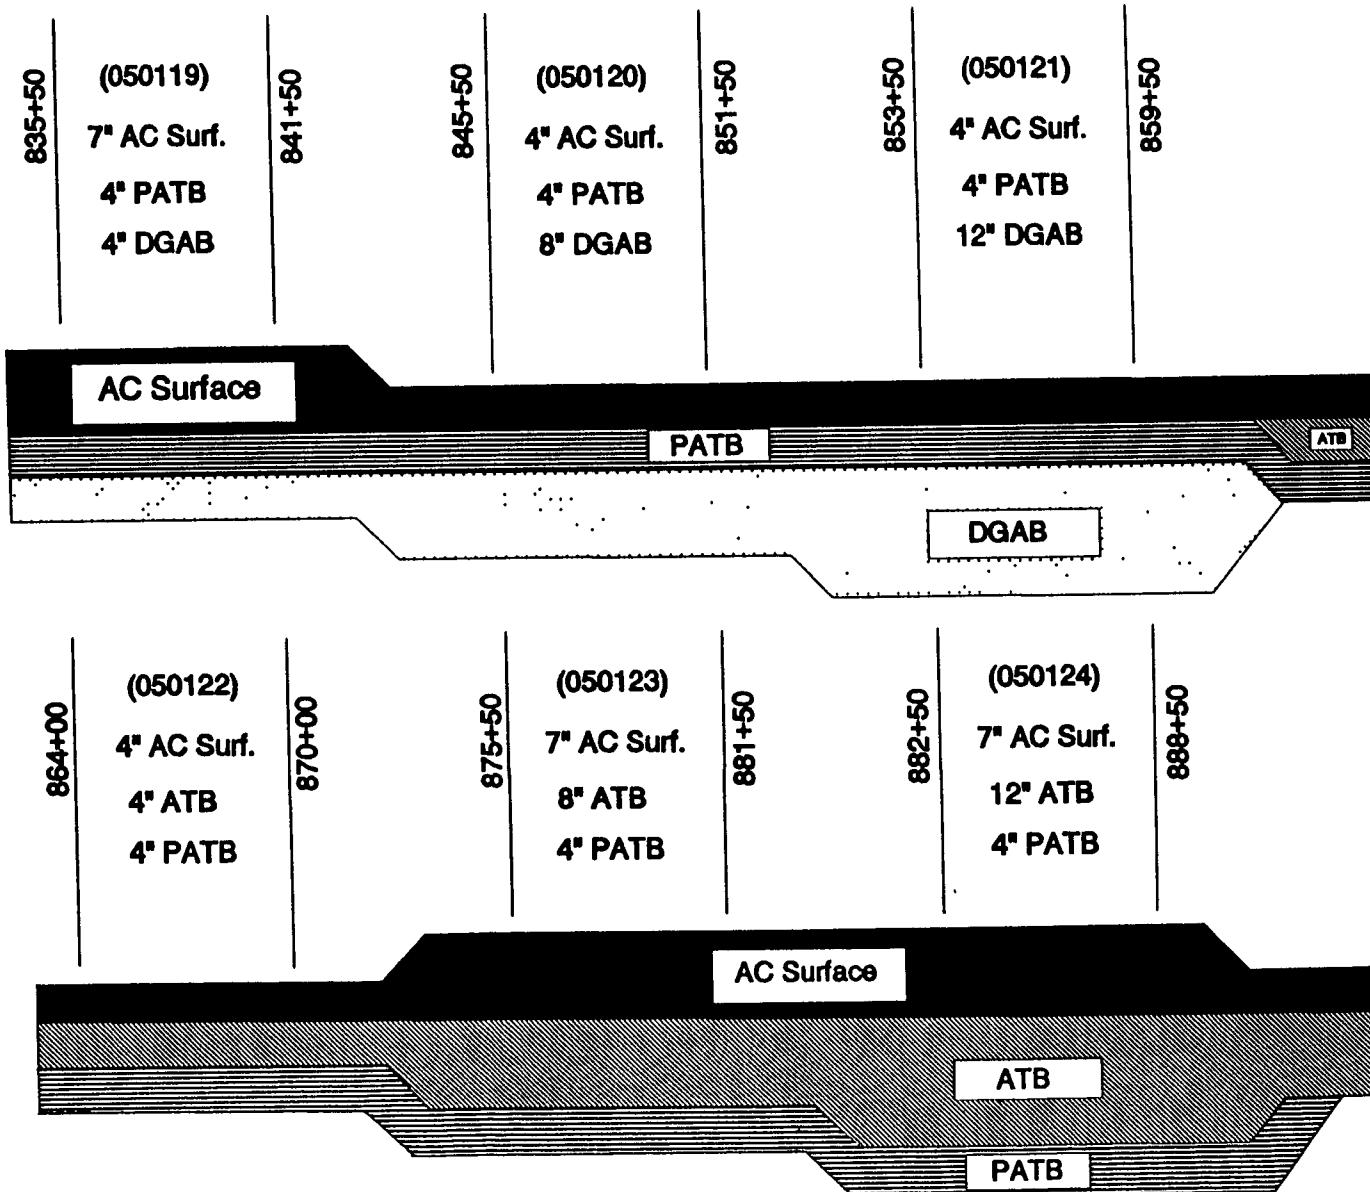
LAYOUT OF TEST SECTIONS WITHOUT DRAINAGE
